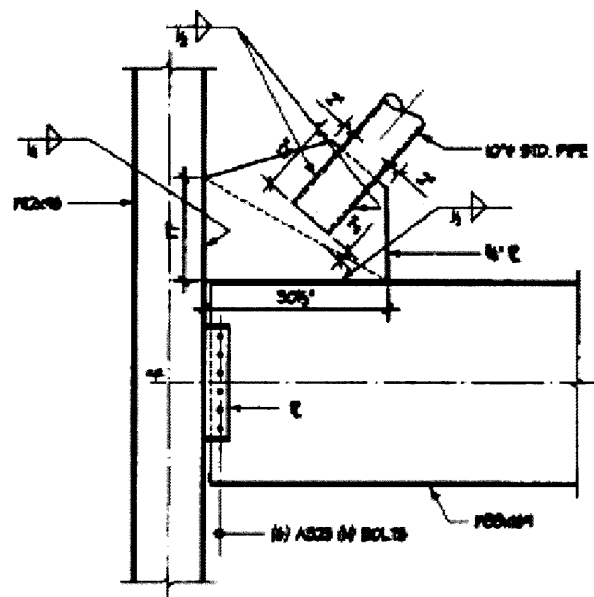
Seismic beam-column-brace welded gusset connection (Source: Lundeen, 25-5)
